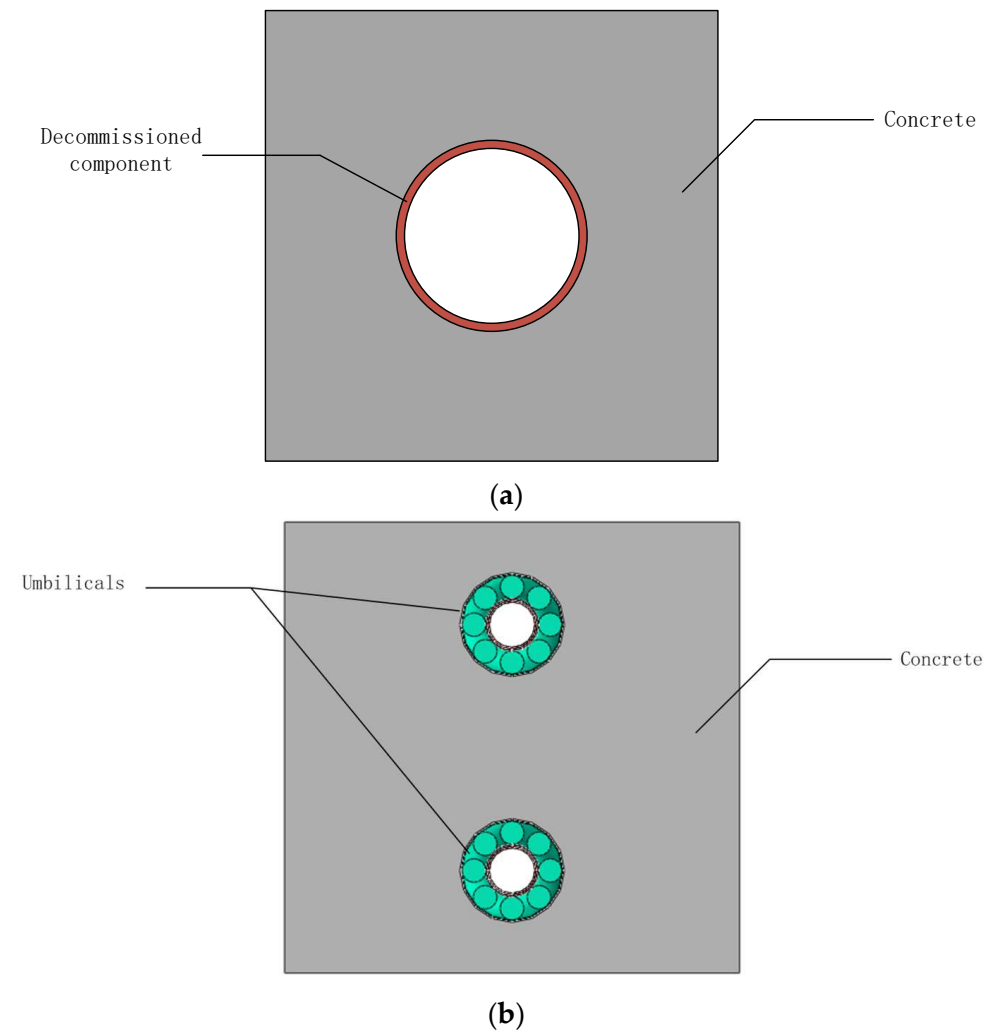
Schematic of beam cross-section. (a) General cross-section of the beam. (b) Cross-section of M3U2.
